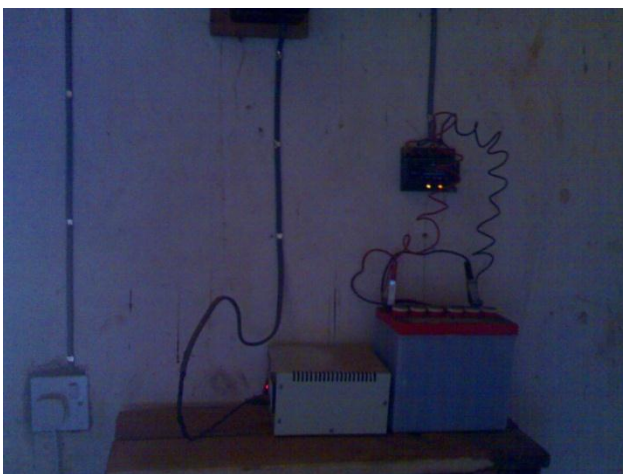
Wrong wire run length and size of cable from solar module to charge controller
